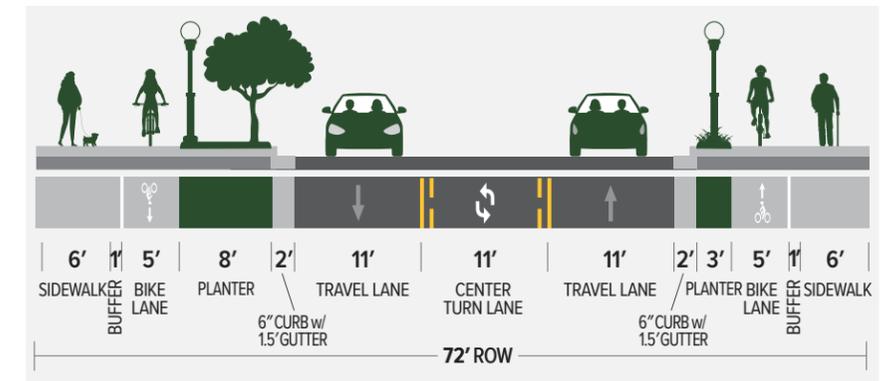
ALTERNATIVE 1 (SIDEWALK IMPROVEMENT)
